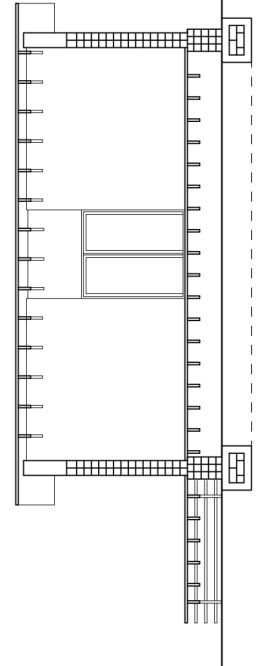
Floor and roof plan of the dogtrot prototype houses
